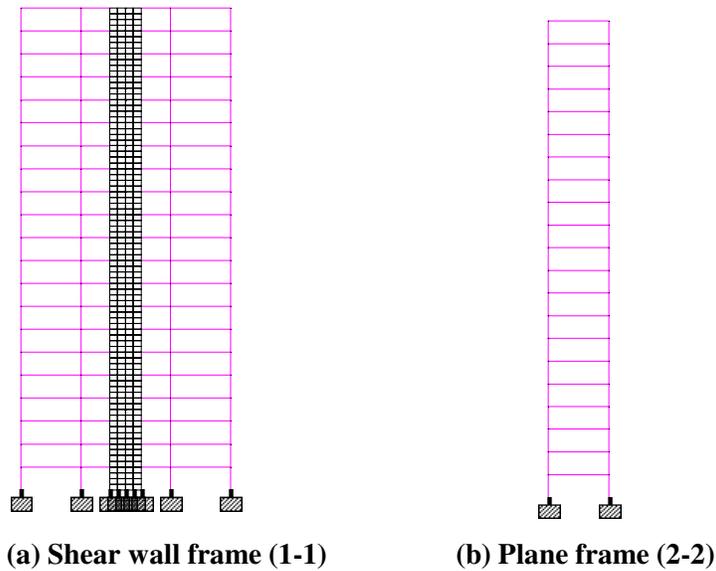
is an example symmetrical twenty-storey reinforced concrete building, which has similar floor plan at each storey up to the twenty storeys. The structure at each floor comprises of totally 2 shear wall frames (marked 1-1) and 2 plane frames (marked 2-2). The shear wall frame and plane frame are analyzed as two individual systems.
